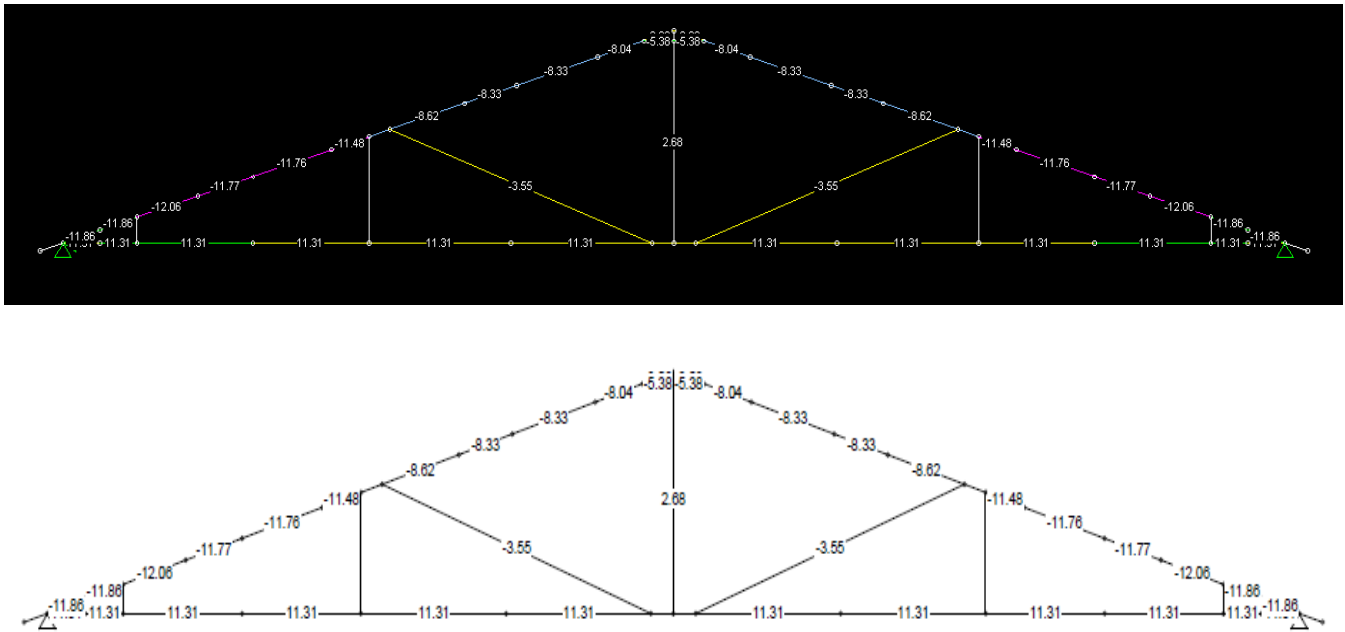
Bending diagram of Truss Design Capacity with roof battens at 800mm spacing
